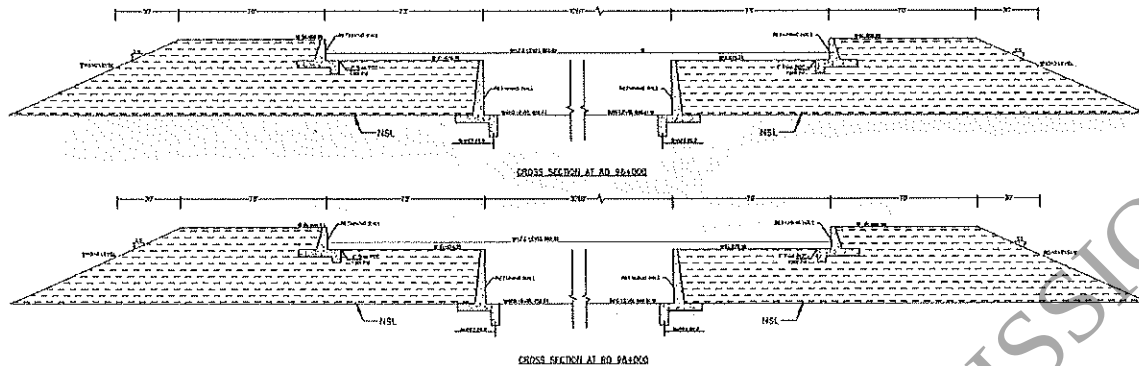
Typical cross-section of Retaining wall (Phase-03)
